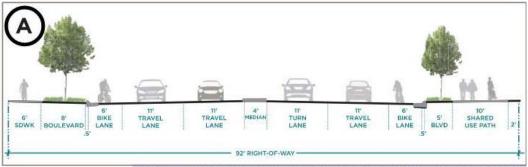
Preferred Alternative East Broadway Segment 'A' Typical Section Looking East
